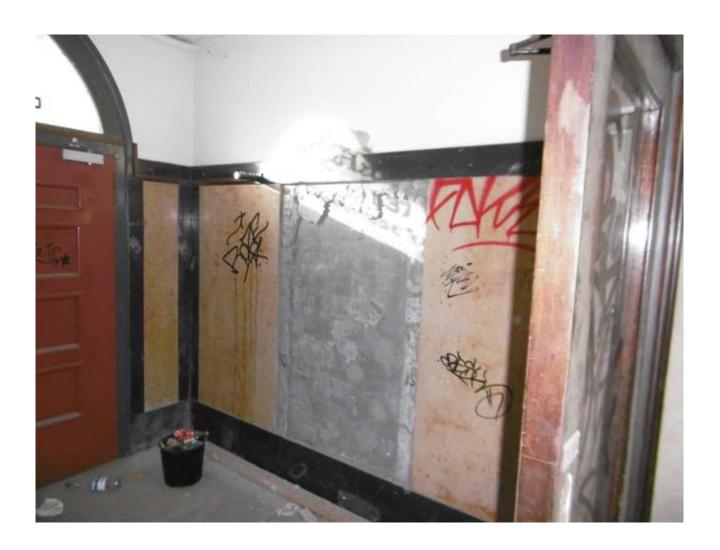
DETAIL OF CRACKING IN THE NORTH EAST CORNER
